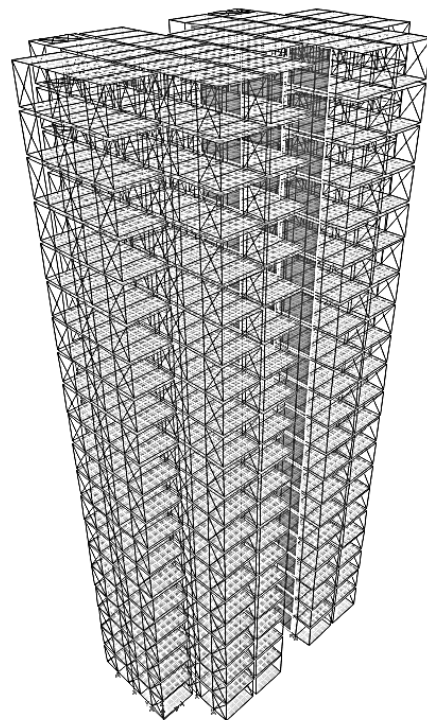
4. 3D finite element model for the 20 storey structure (Note: only the load bearing elements are modelled)
